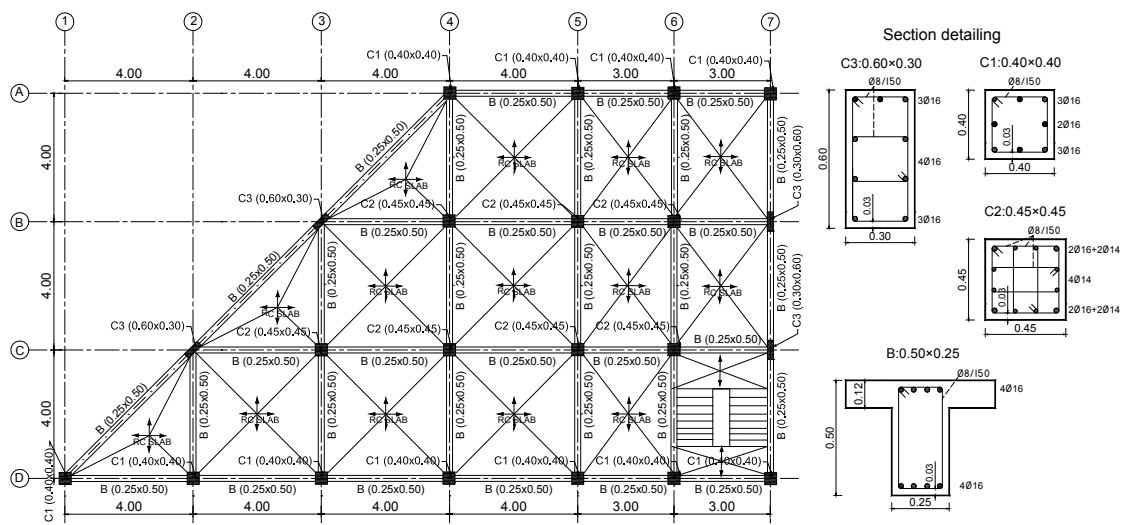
Plan view of a typical story of the 3-Ir, 4-Ir and 5-Ir buildings and design details.
